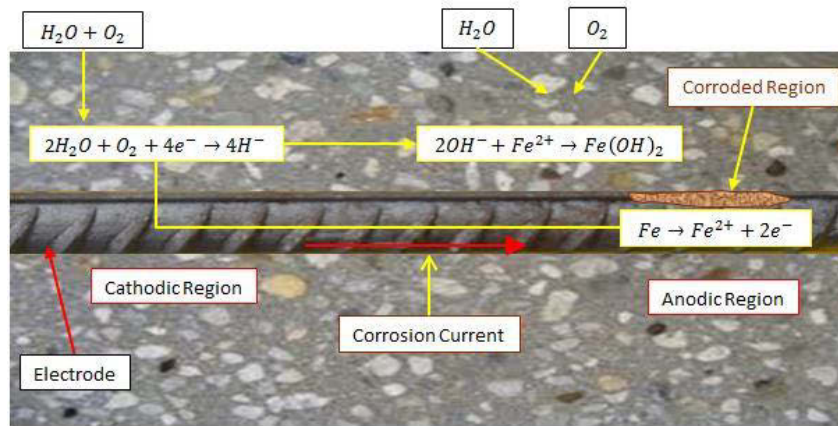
Galvanic corrosion of the steel reinforcement in concrete
